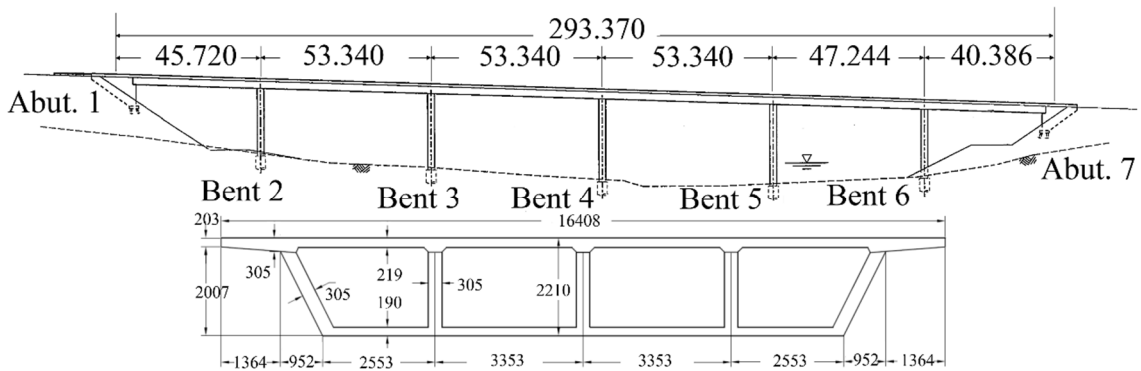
Elevation view (m) and the box-girder cross section (mm) for the short-span PCBBs
